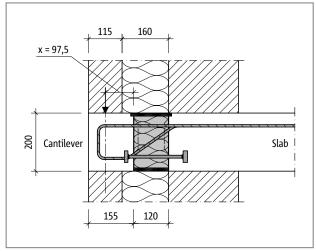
Schöck Isokorb® XT type O: Wall construction for design example
